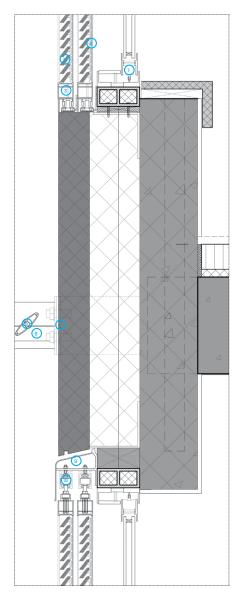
Vertical wall section from the connection of the sliding shutter to the window
